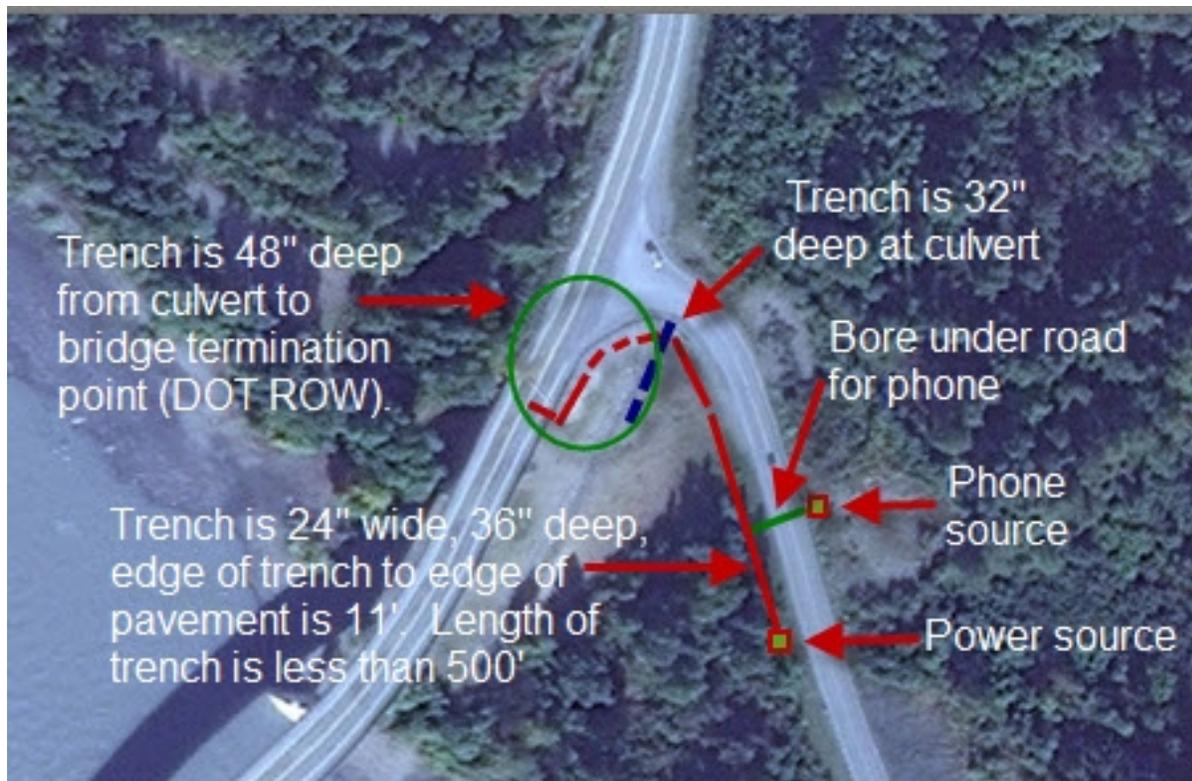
Plan View: Excavation for Installing Power and Fiber at the Bridge Site.
